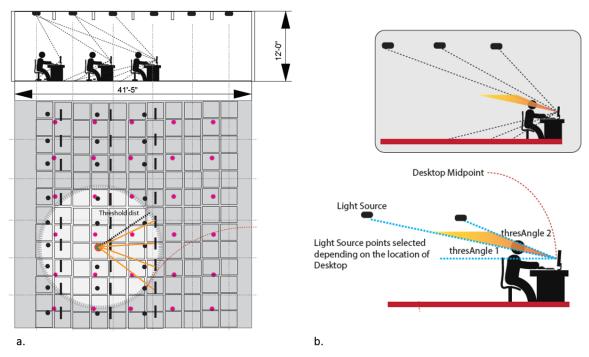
a. Detailed floor layout with room section elaborating the furniture arrangement with the lighting plan. Pink dots represent the lights while black dots represent the user. b. Schematic sections explaining the lighting computations studied to conduct the glare calculation for the user.
